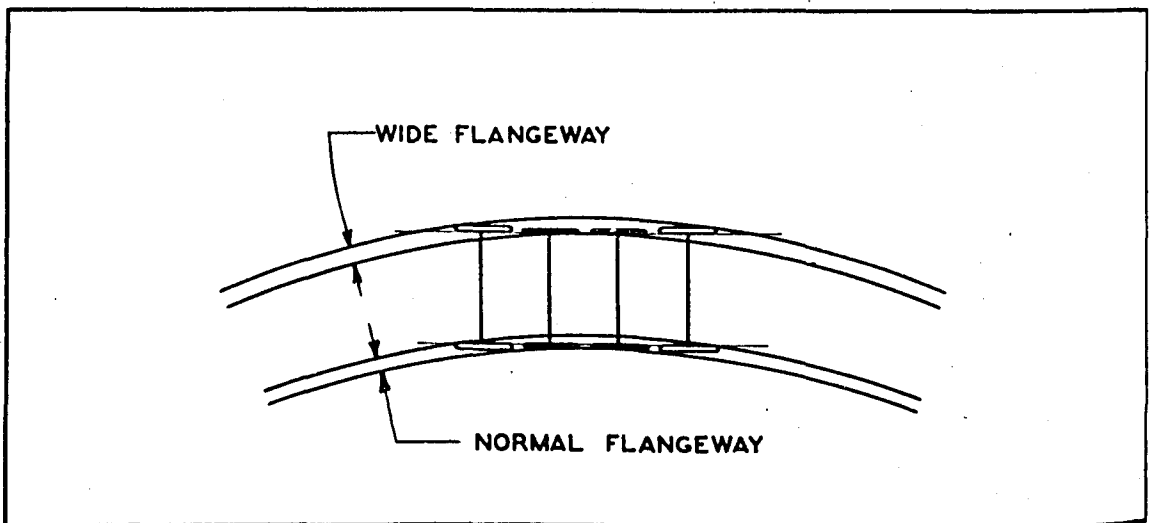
WIDENING OF FLANGEWAY ON OUTER RAIL.
